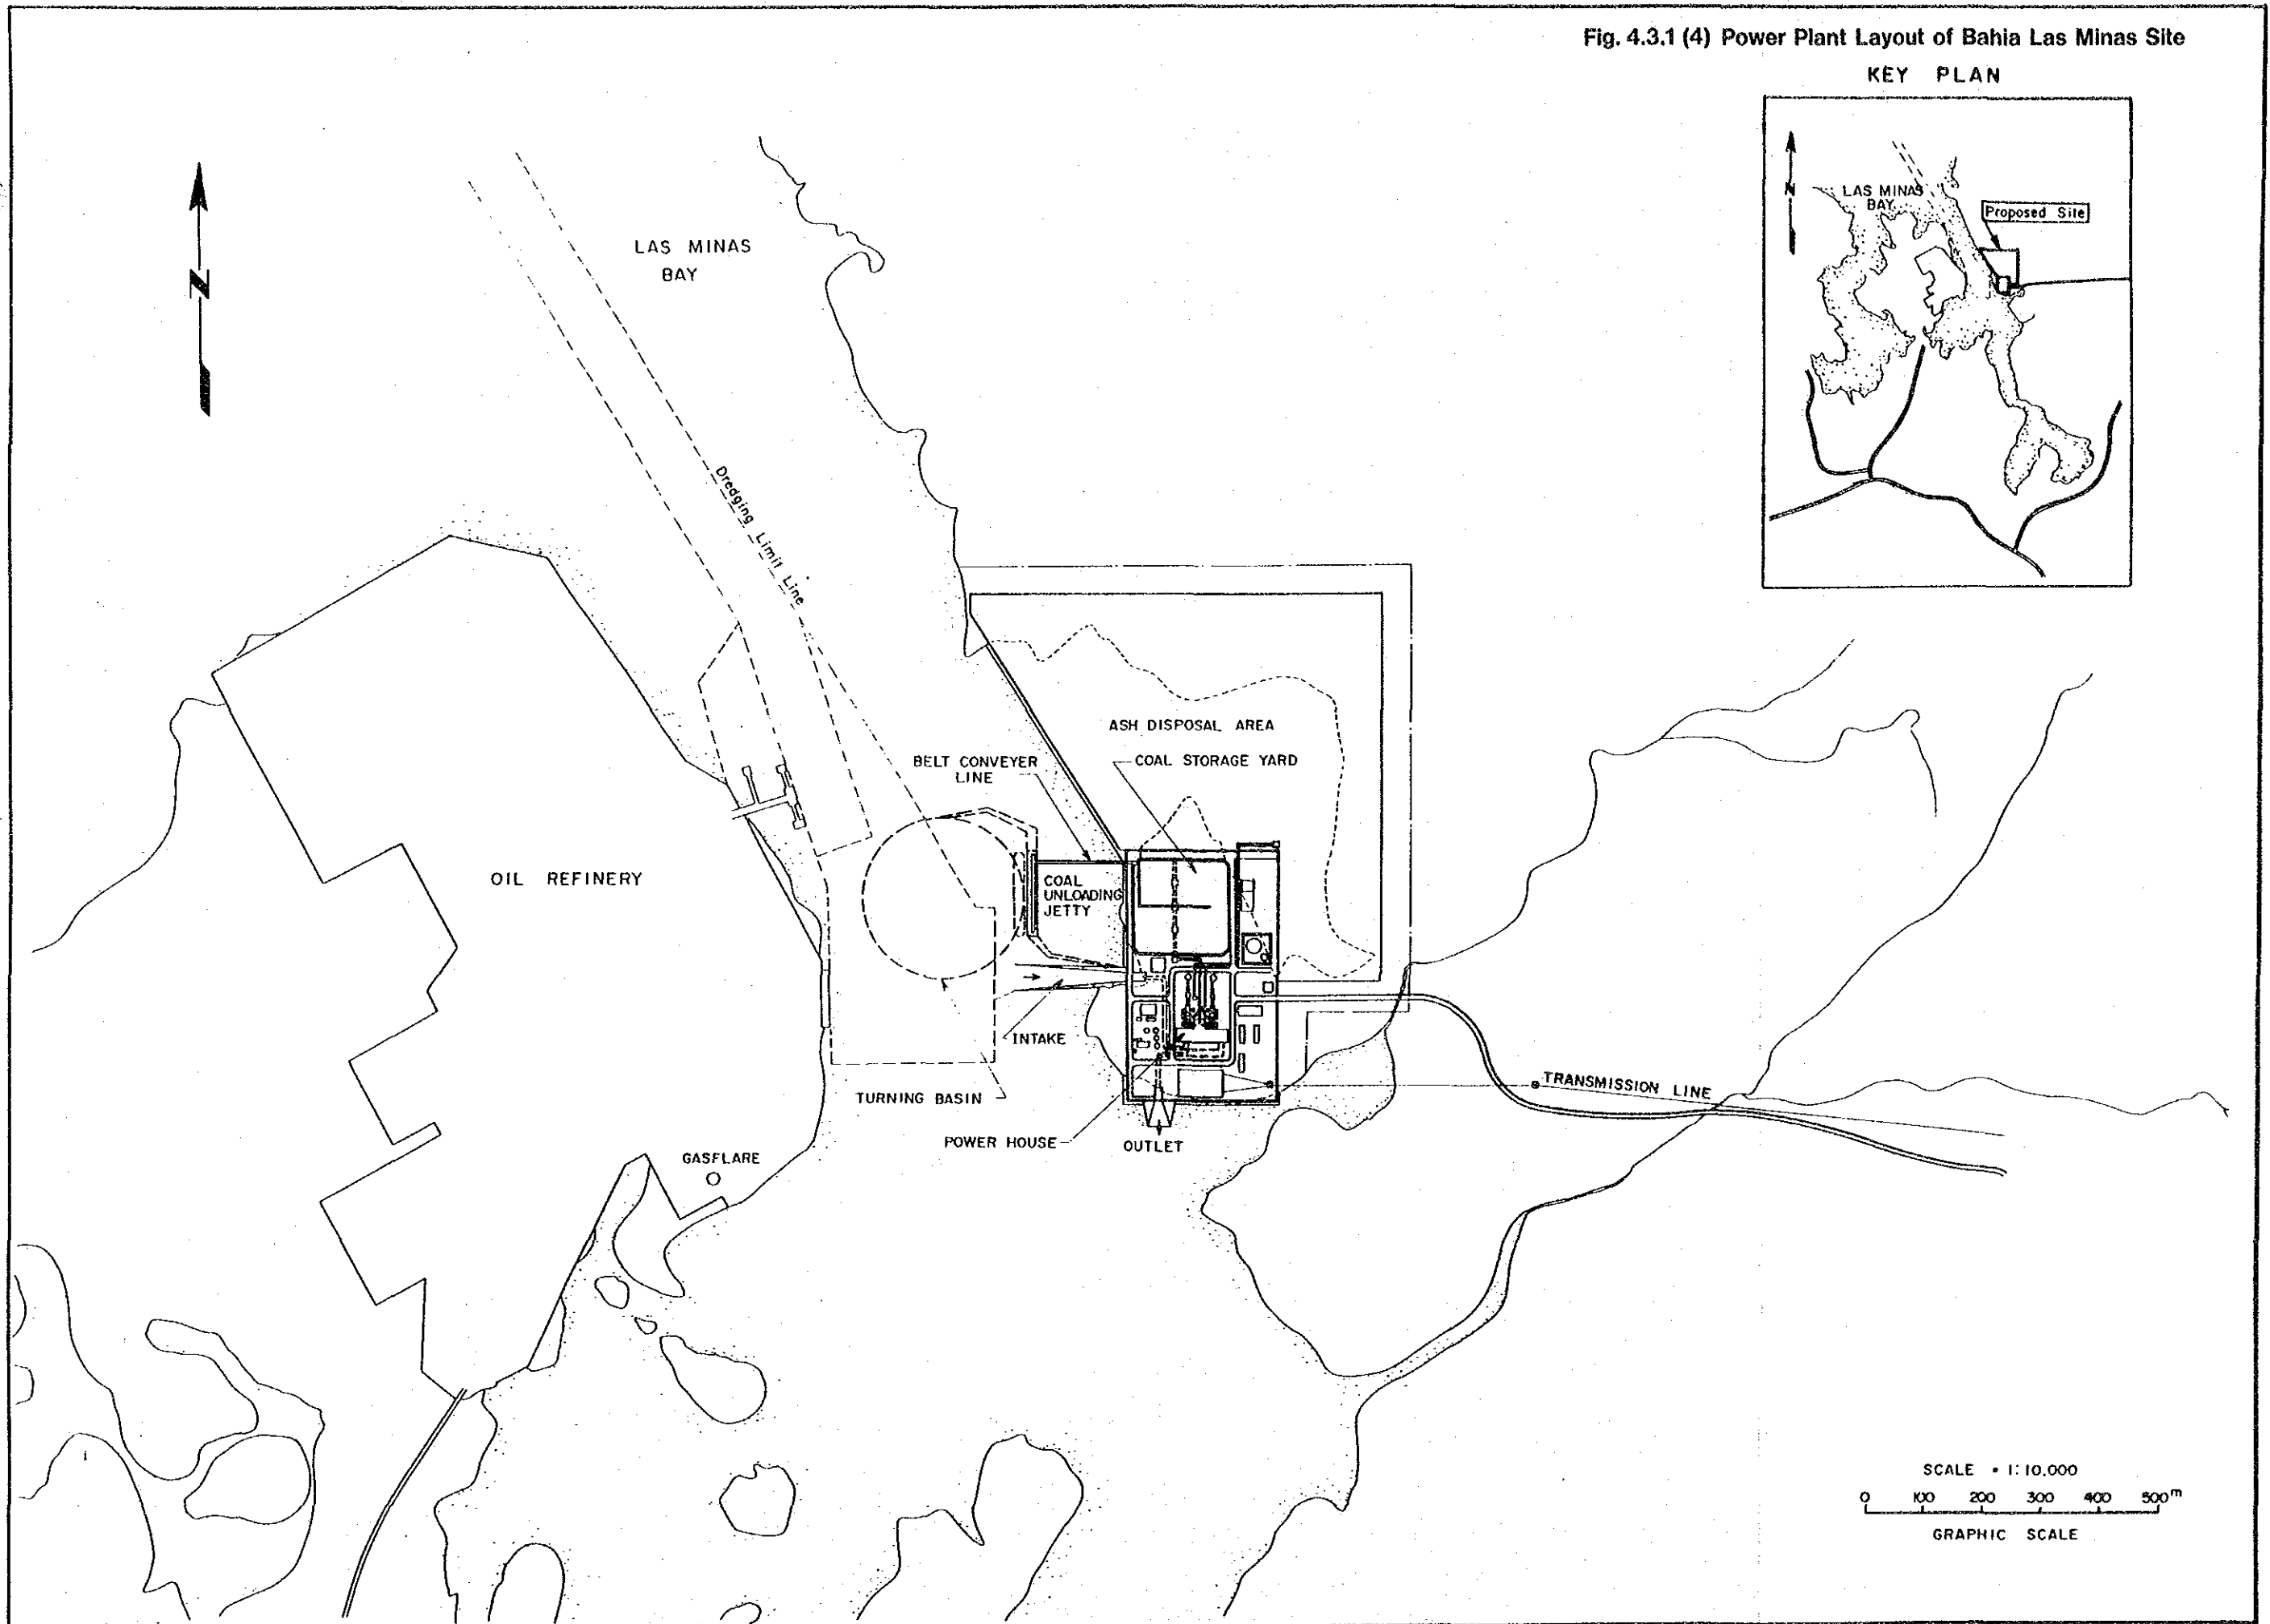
(4) Power Plant Layout of Bahia Las Minas Site
